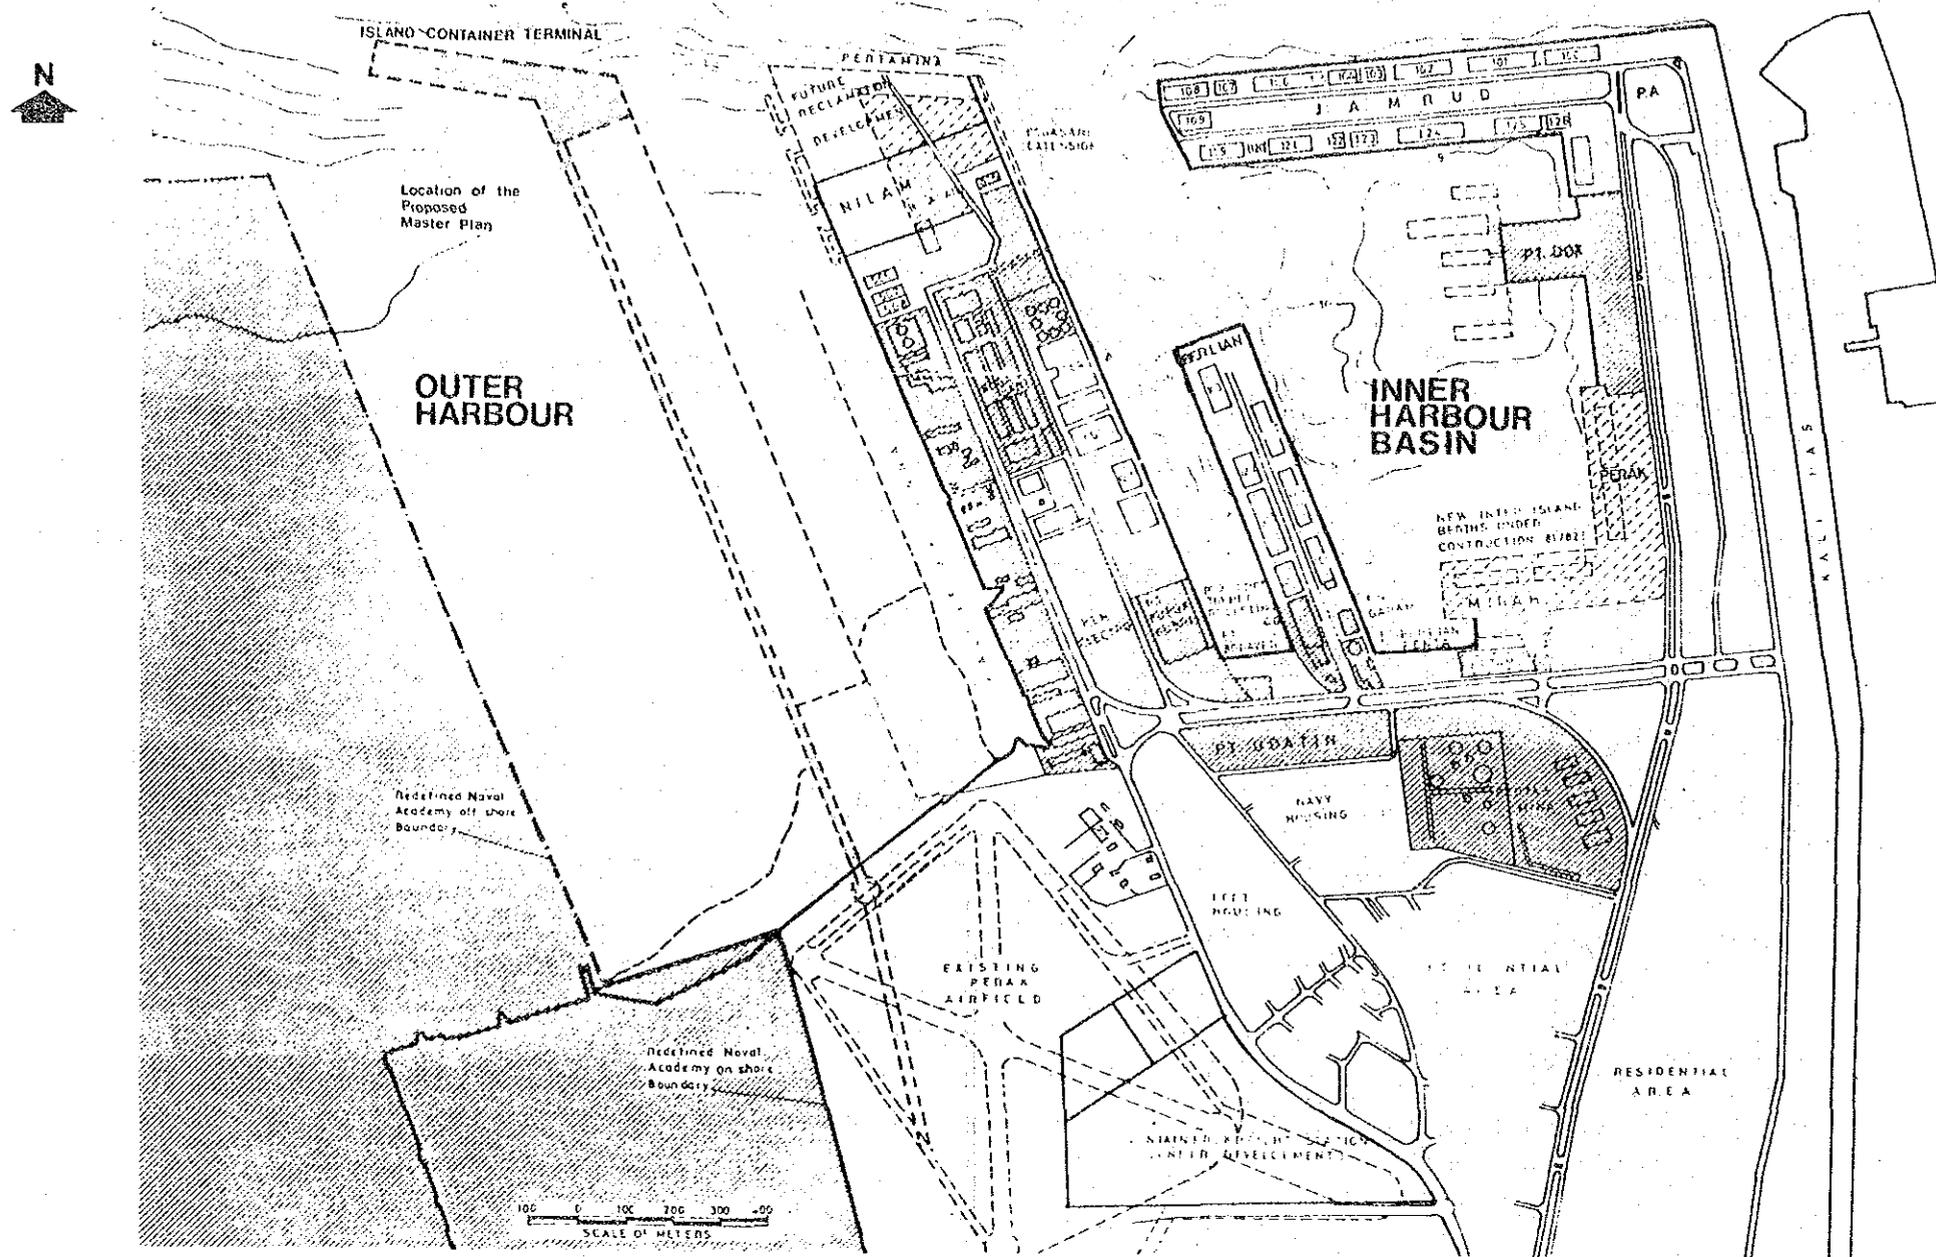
TG. PERAK SURABAYA PORT EXISTING PORT LAYOUT
